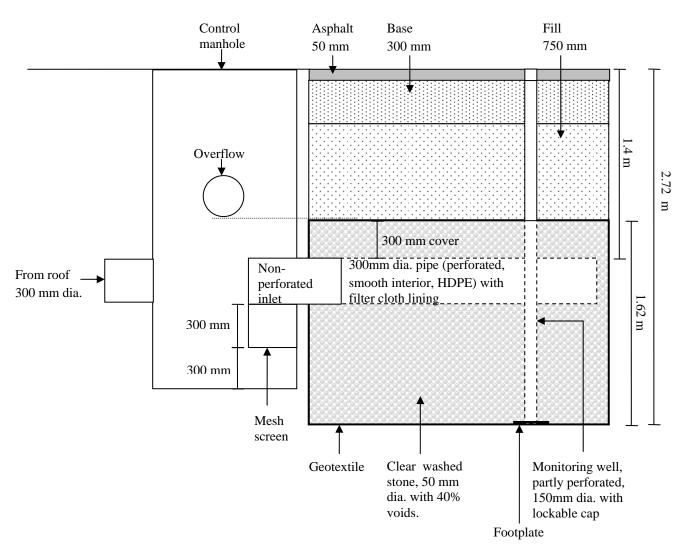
Cross section of infiltration trench receiving roof runoff only.
